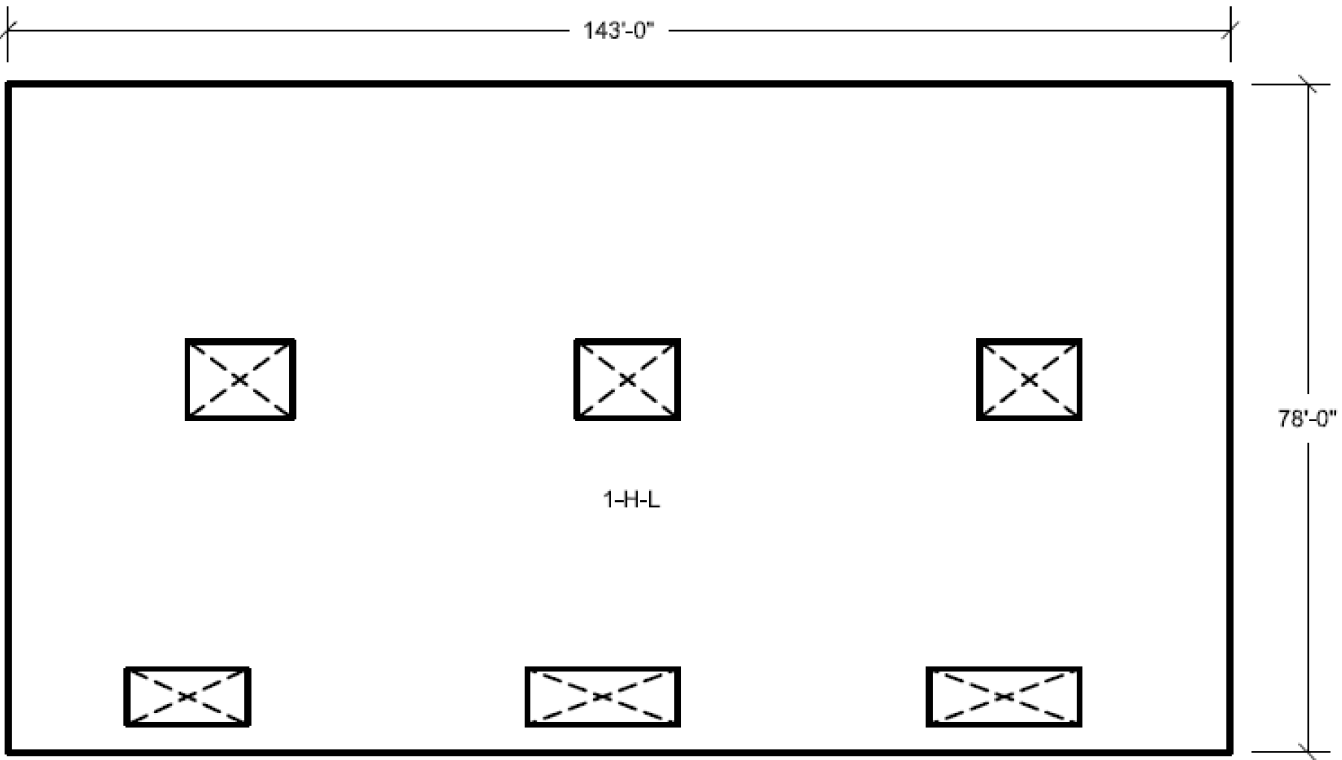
H.6-127 Pump House Floor El 15'-2" East/ West Reinforcement Zones Top Face
